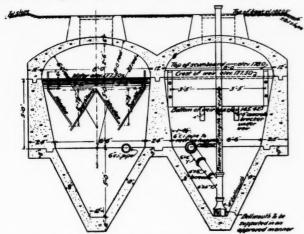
CROSS SECTION OF PRELIMINARY SETTLING TANK.
